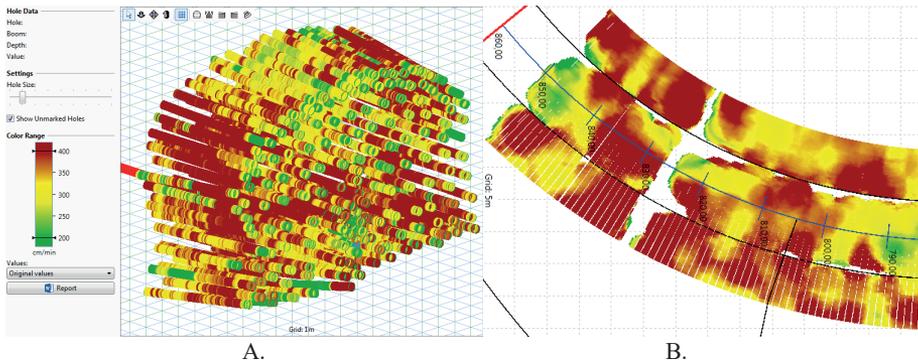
Penetration rate of one blast round in Underground Manager of section 796 in Tunnel 214 (A) and the interpolated penetration rate on the tunnel contour in the first 65 m of Tunnel 214 (B).
